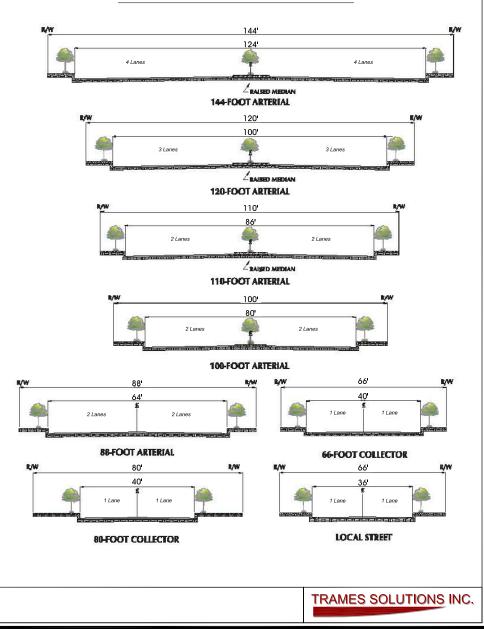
B CITY OF RIVERSIDE MASTER PLAN OF ROADWAYS AND STANDARD ROADWAY CROSS-SECTIONS
